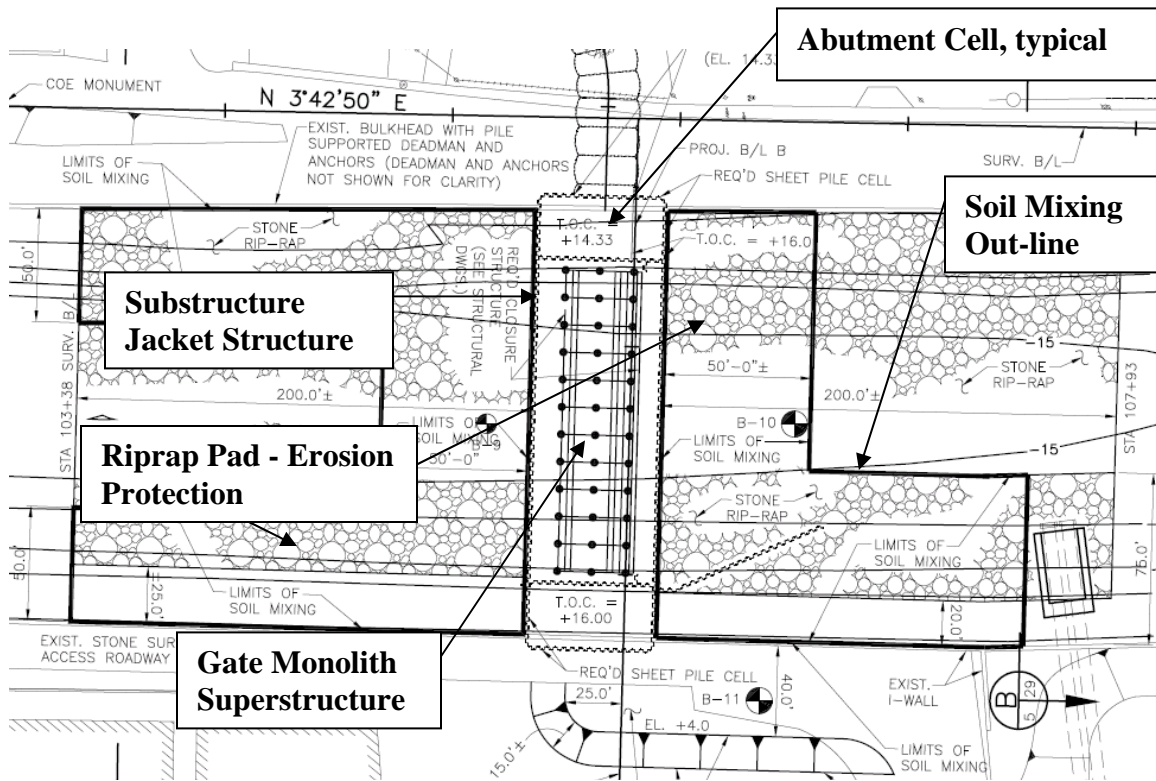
17th Street ICS Phase 1 Gate Closure Monolith Site Plan
